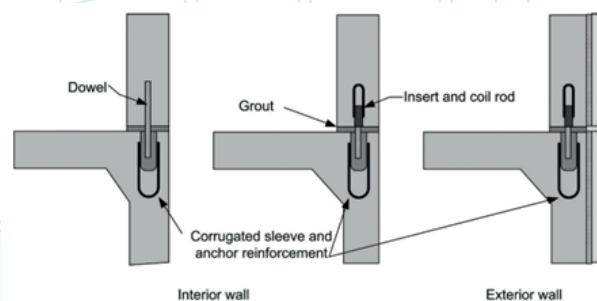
Schematic interior and exterior wall connections for use in precast concrete modules
